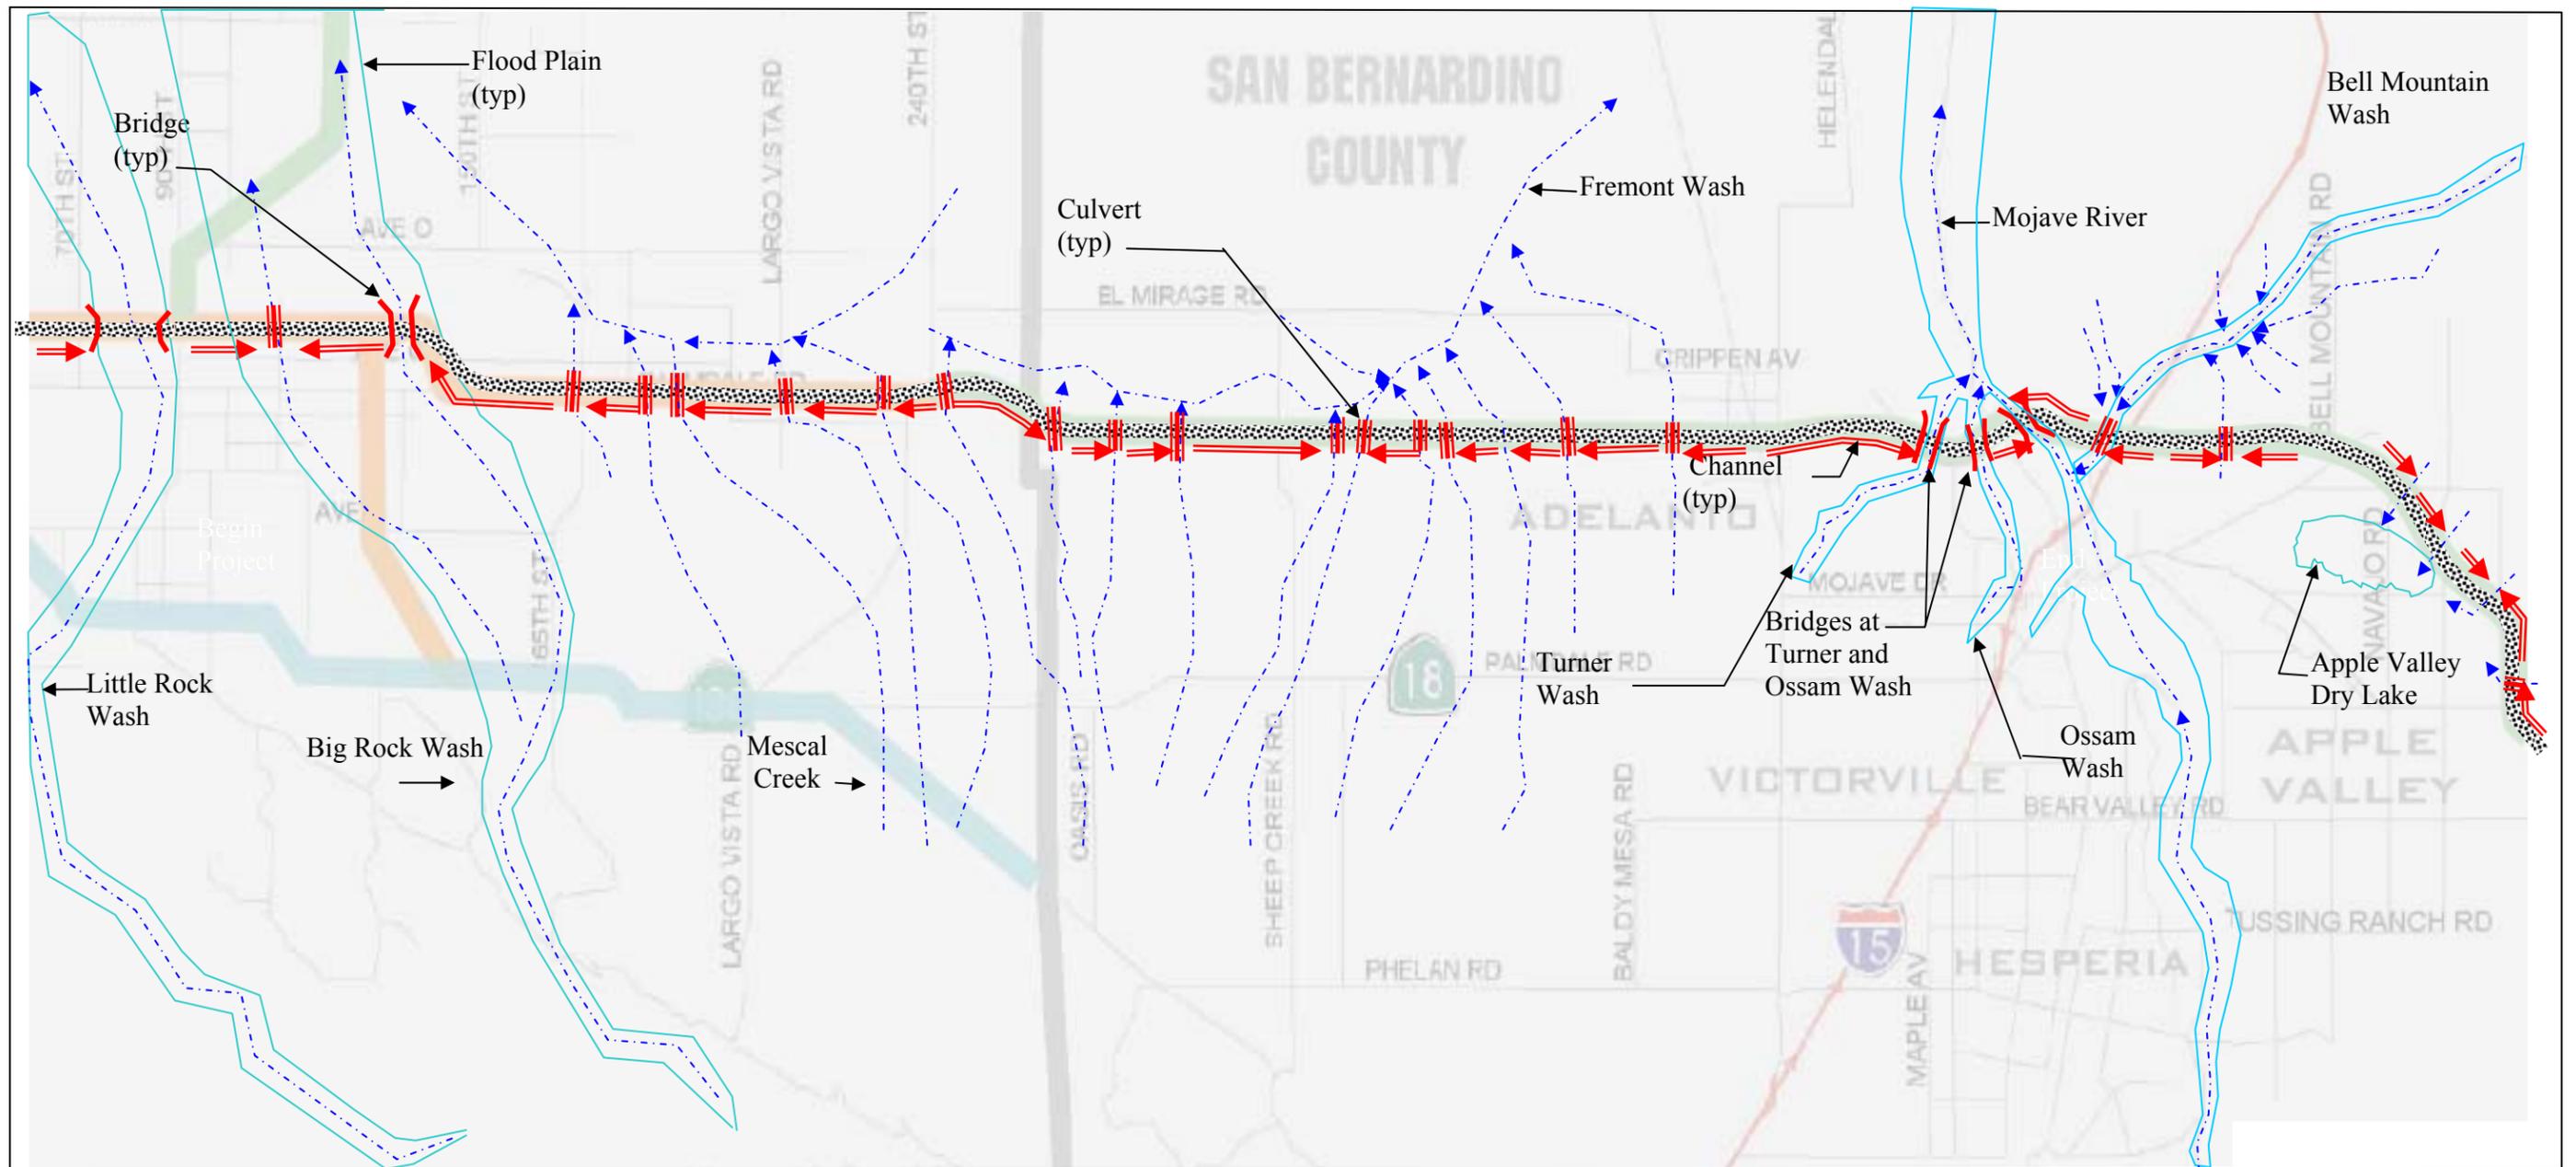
HDC Proposed Off-Site Drainage System Schematic
